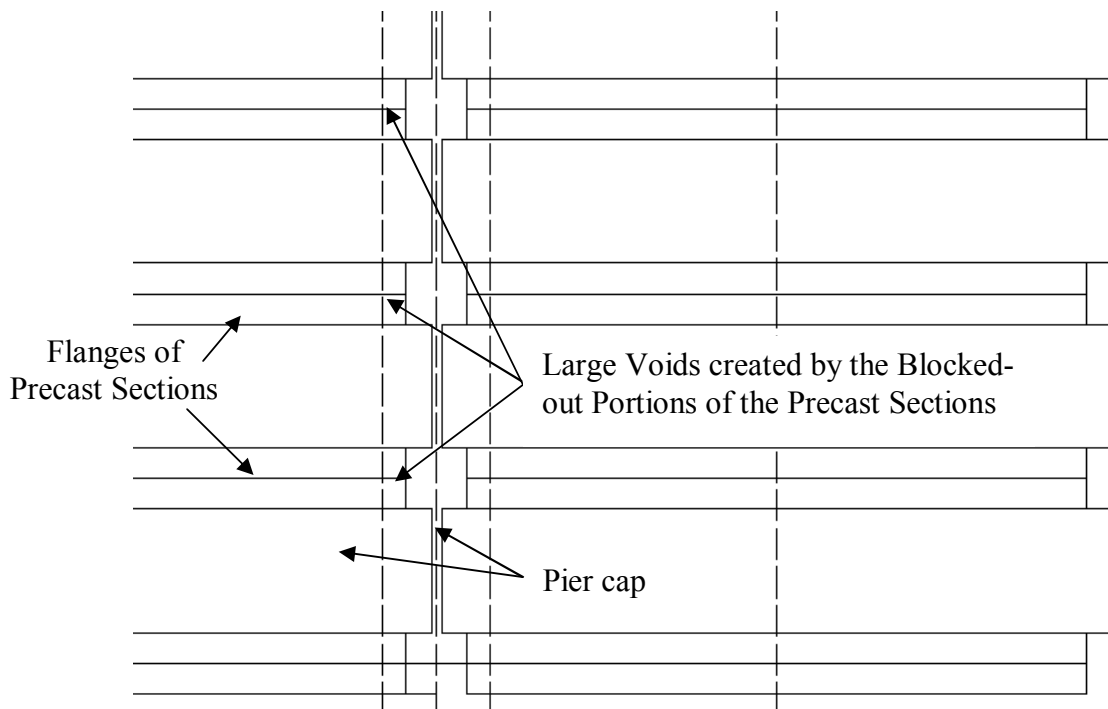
Plan view of precast section layout showing blocked-out portions of the precast section flanges
